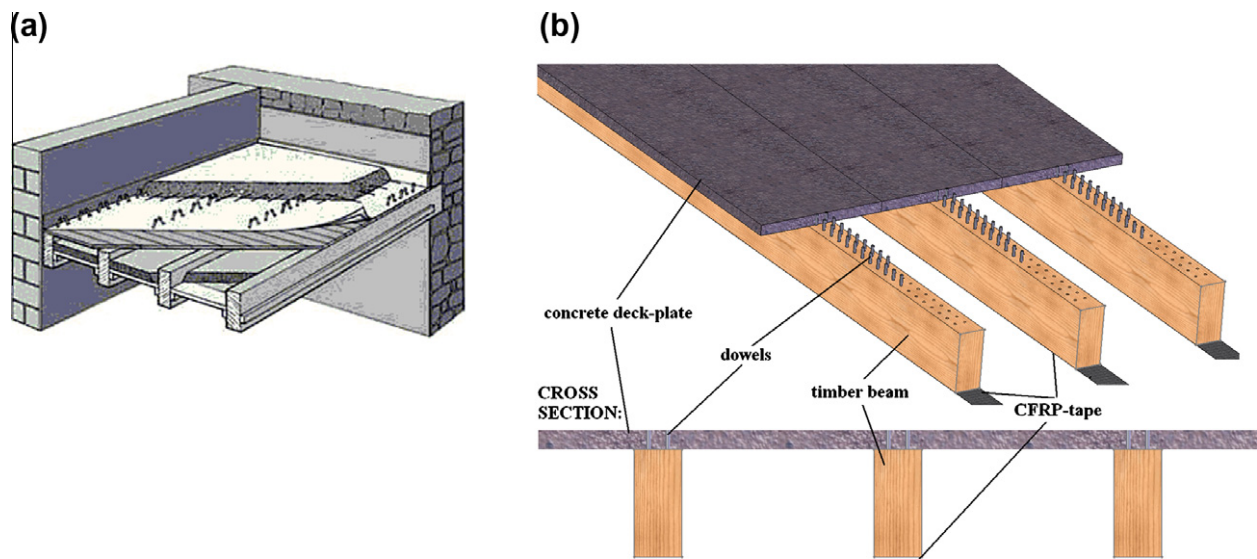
Types of reconstruction of old timber floors with a concrete slab (a) and additionally with CFRP strips (b).
